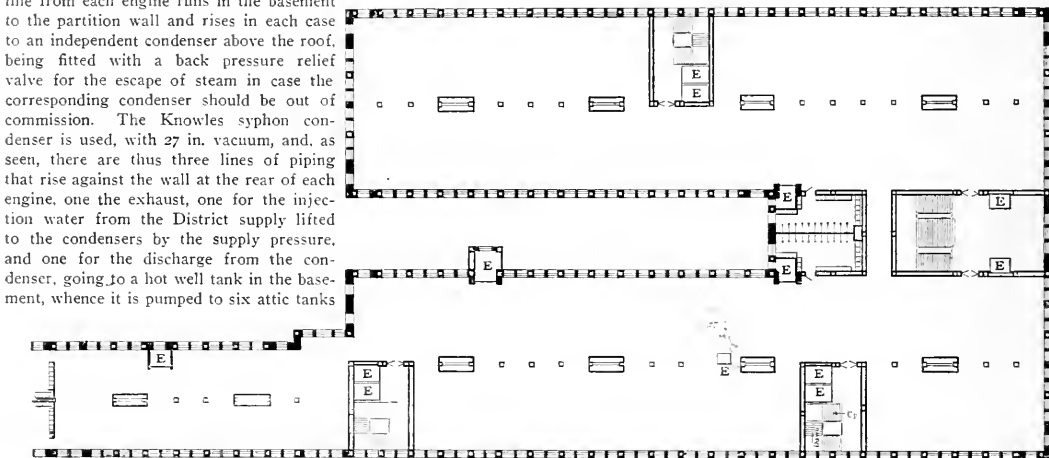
TYPICAL PLAN OF FLOOR IN NEW BUILDING FOR GOVERNMENT PRINTING OFFICE. E, ELEVATORS.
